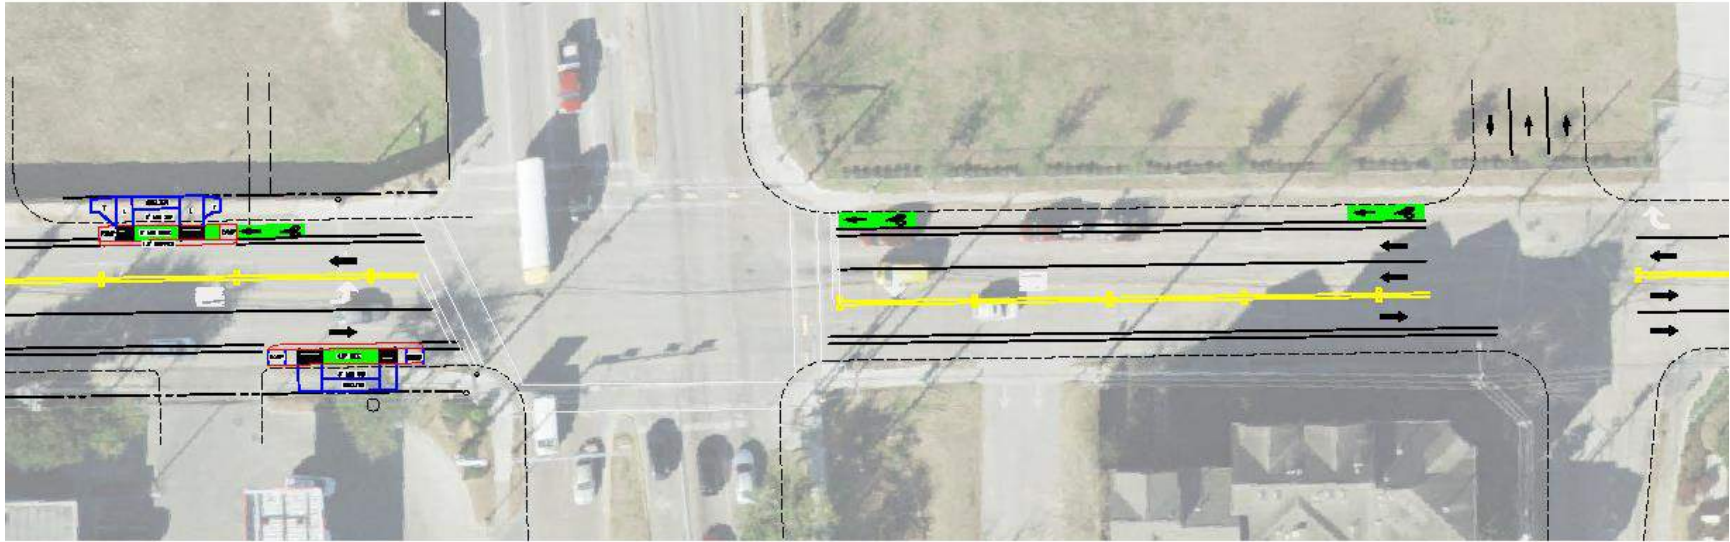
Proposed W Dallas Street & Montrose Boulevard Intersection Schematic
